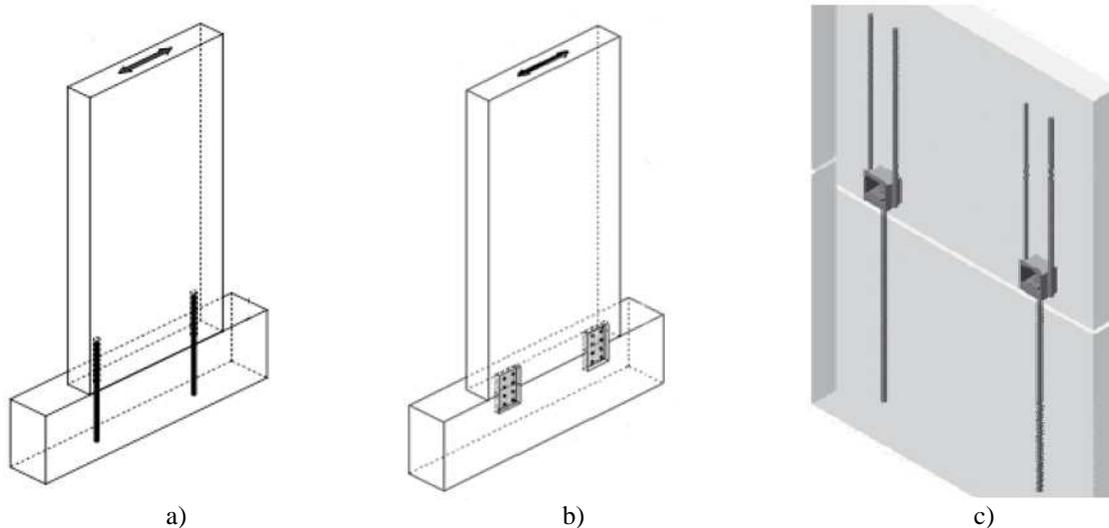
Connection types considered in the experiments: (a) ‘rebar’ connections; (b) ‘steel plate’ connections; (c) industrial wall shoes.
